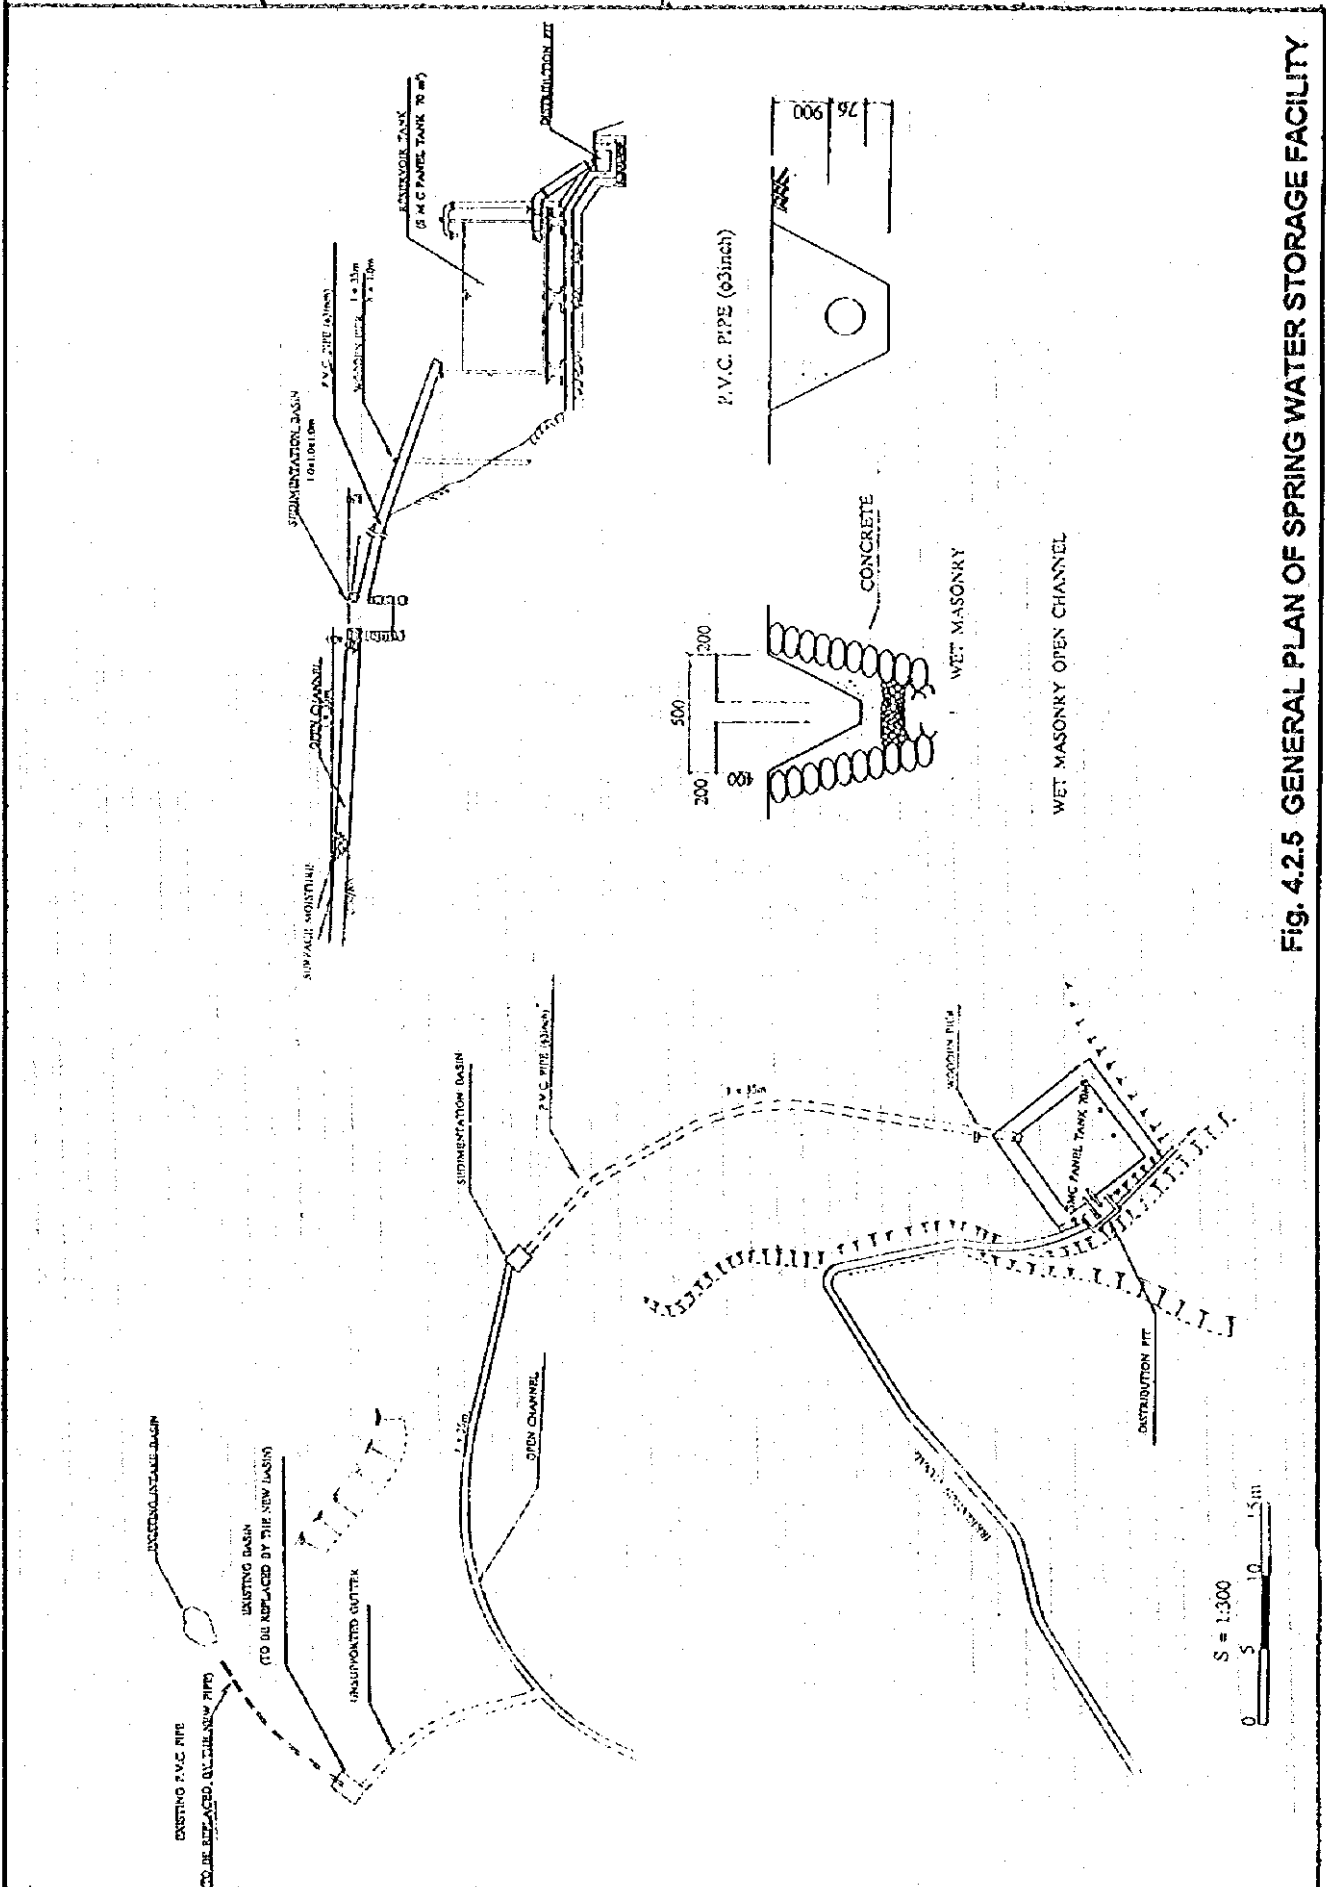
GENERAL PLAN OF SPRING WATER STORAGE FACILITY
